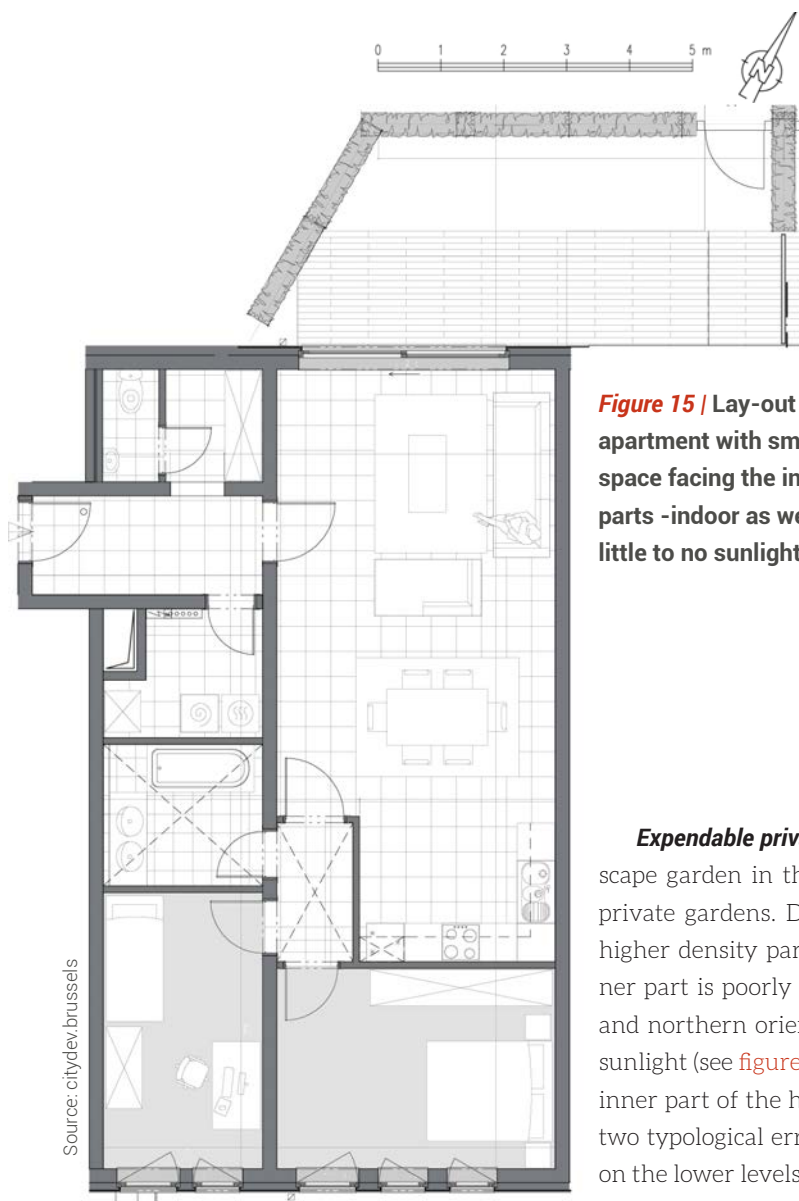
| Lay-out of ground floor apartment with small private outdoor space facing the inner courtyard. Many parts -indoor as well as outdoor- receive little to no sunlight.
